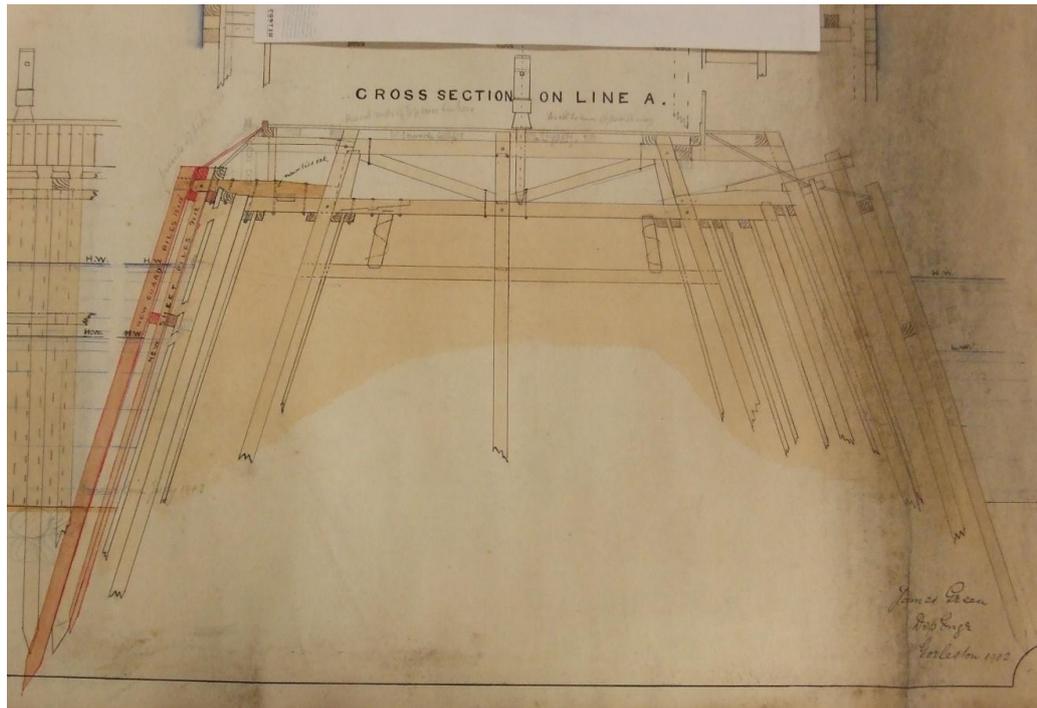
, Detailed section through the south pier, 1902, note multiple re-facing (NRO Y/PH 1360)
